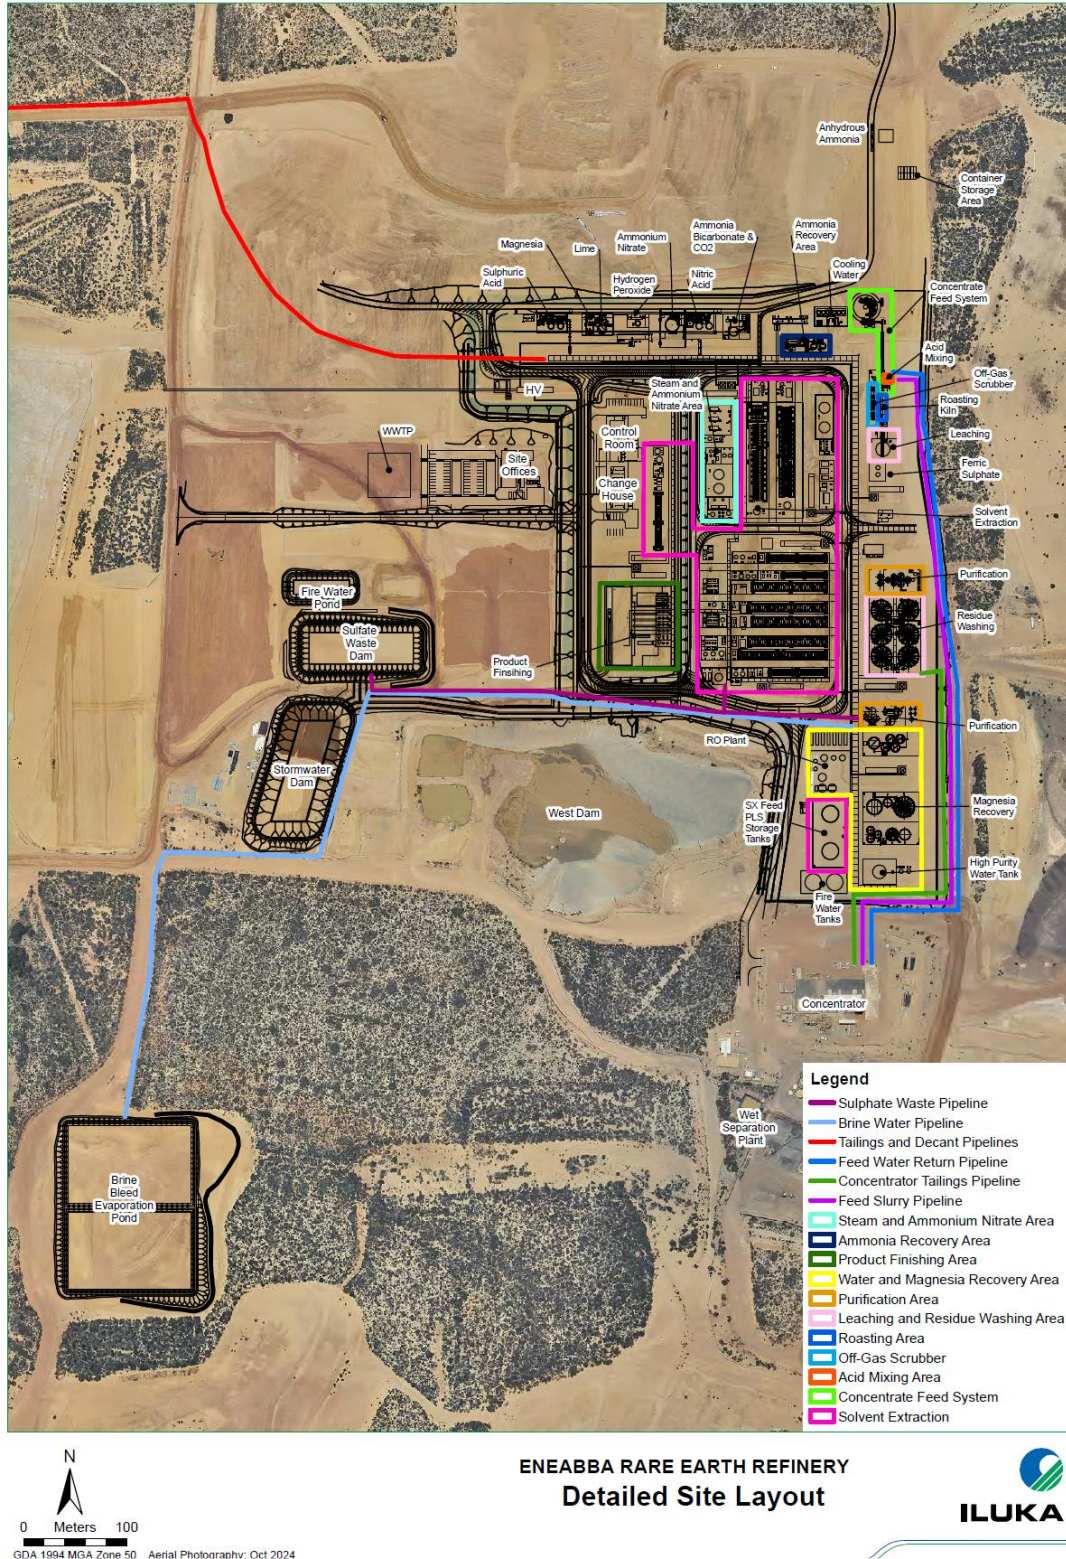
Revised layout of the premises showing the new location of the Brine Bleed Evaporation Pond, Stormwater Dam and Sulfate Dam and associated pipelines.
